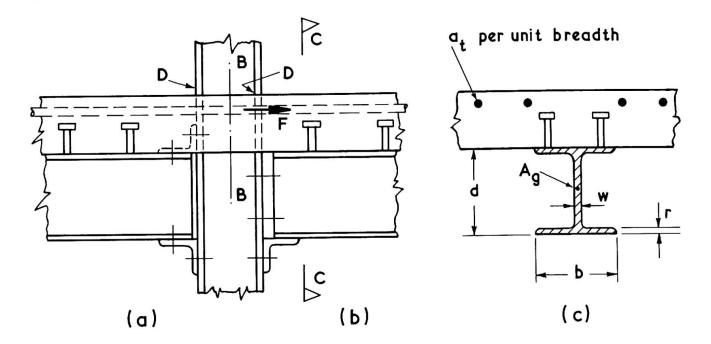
Typical bolted joints between composite beam and steel stanchion
